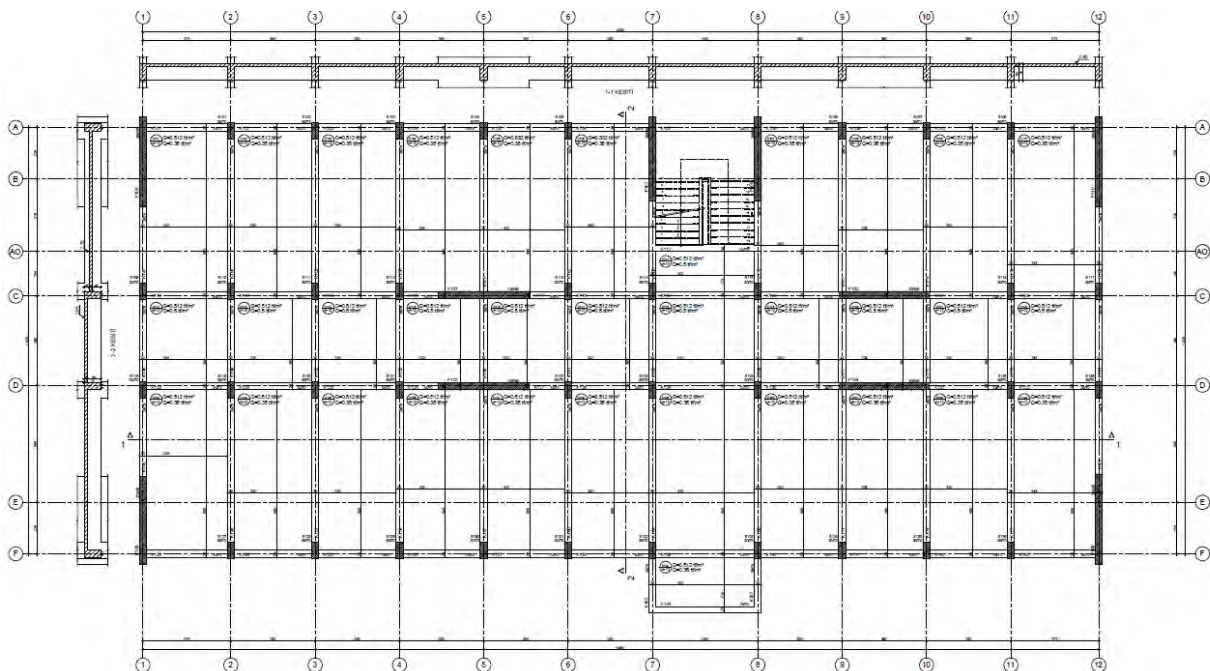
Plan view of Existing 4 Storey6 Building with Shear Walls
